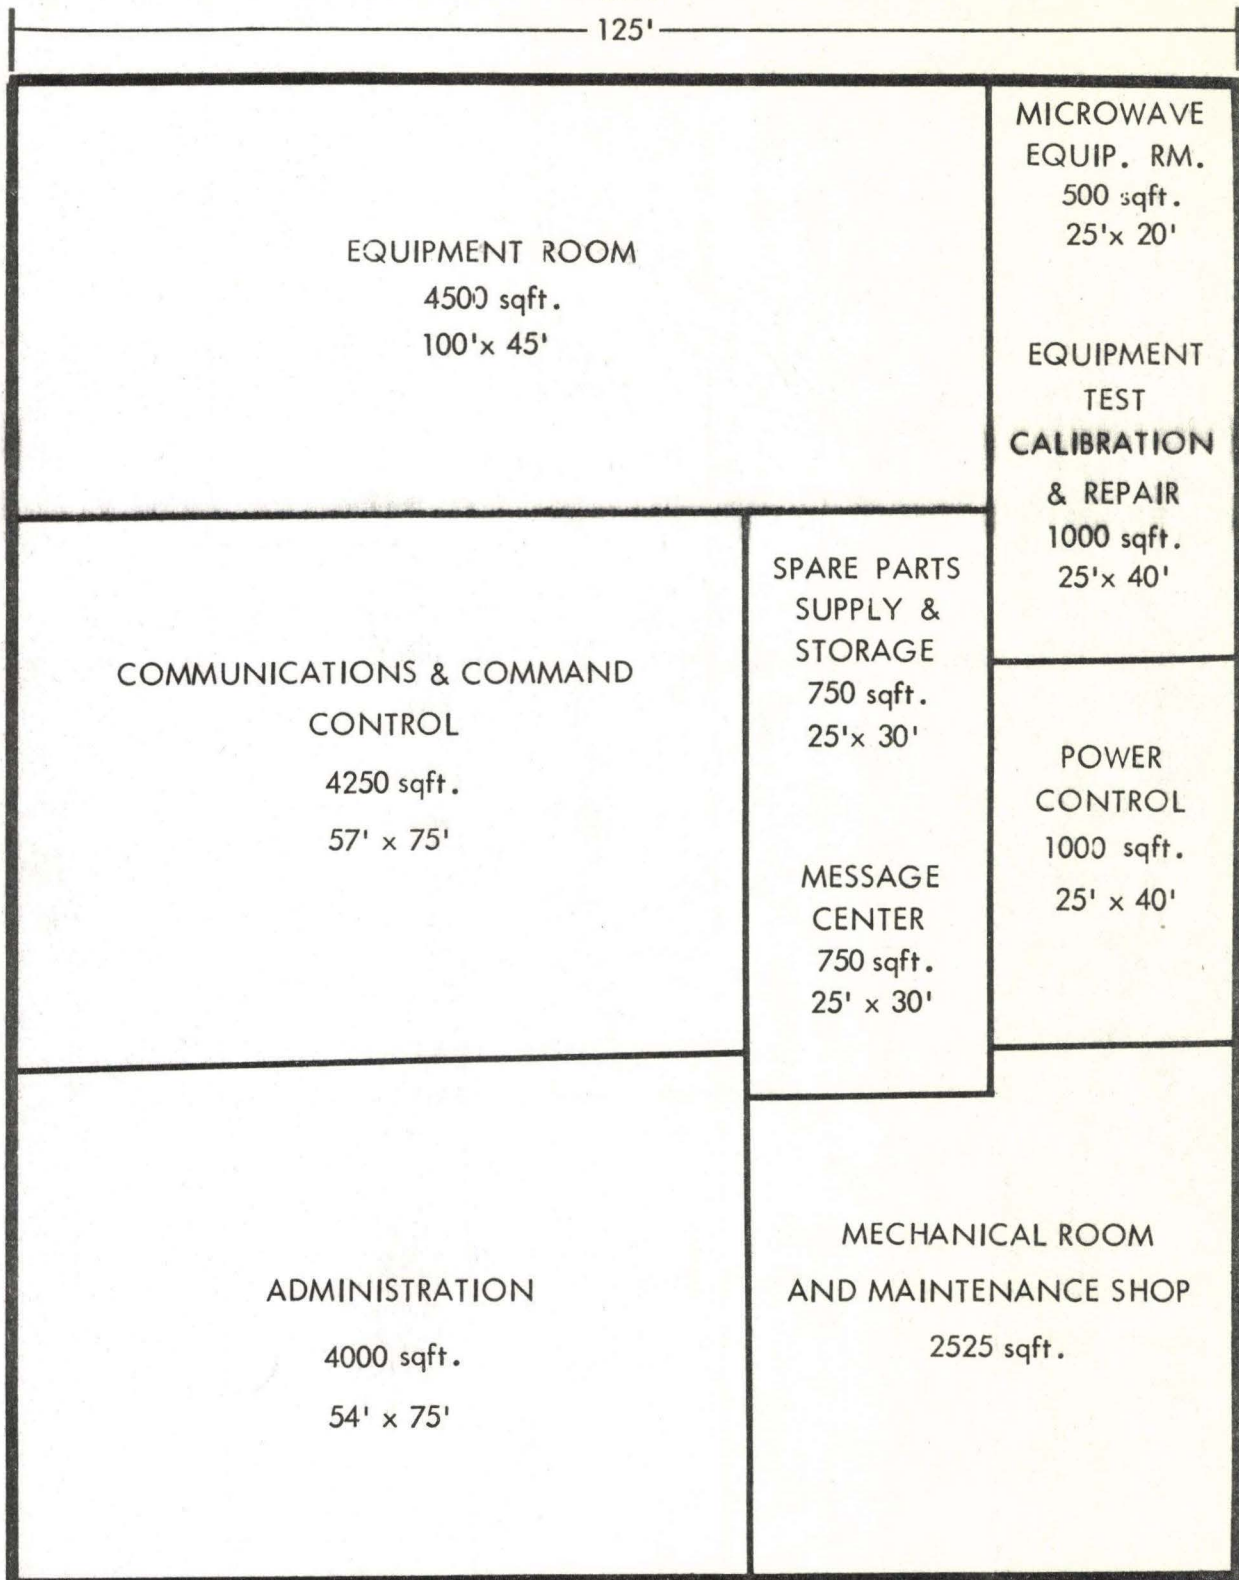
SITE OUTLINE PAUMALU EARTH STATION
